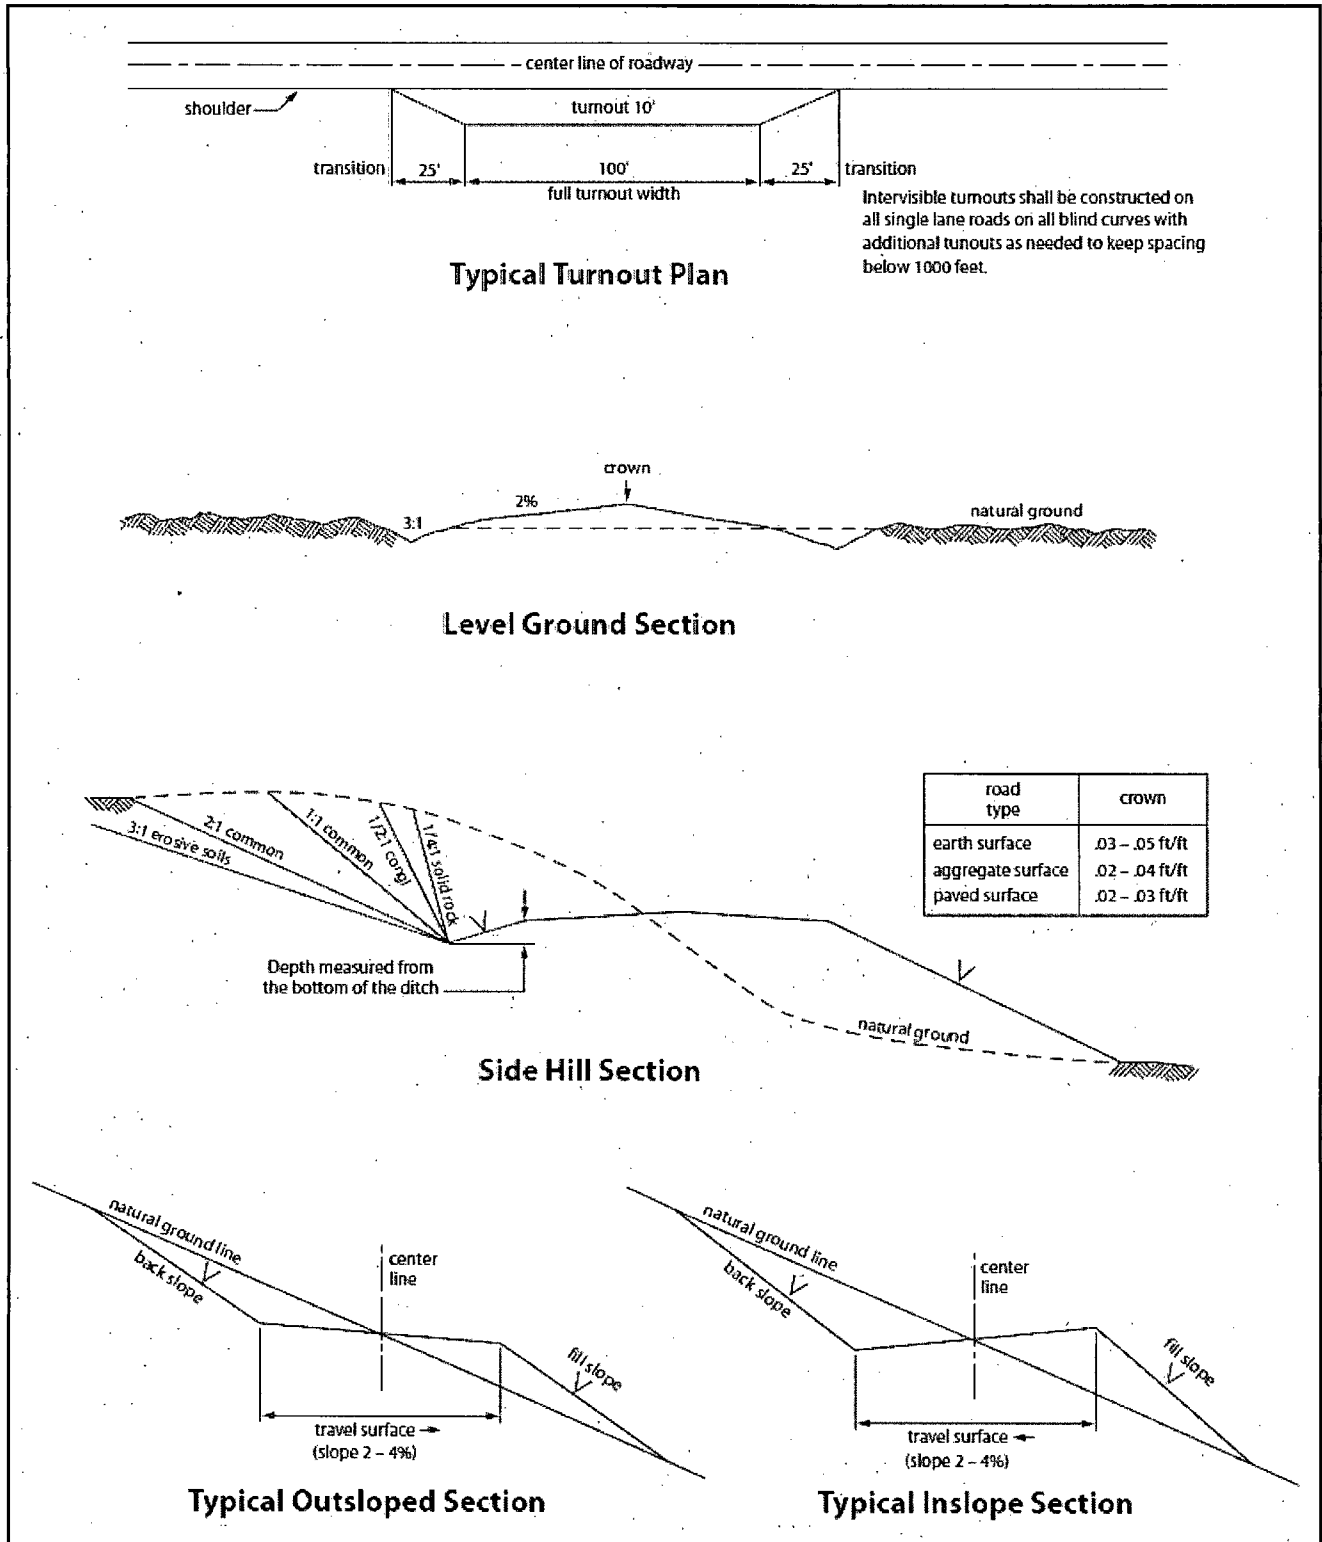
Cross-sections and plans for typical road sections representative of BLM resource or FS local and higher-class roads.
